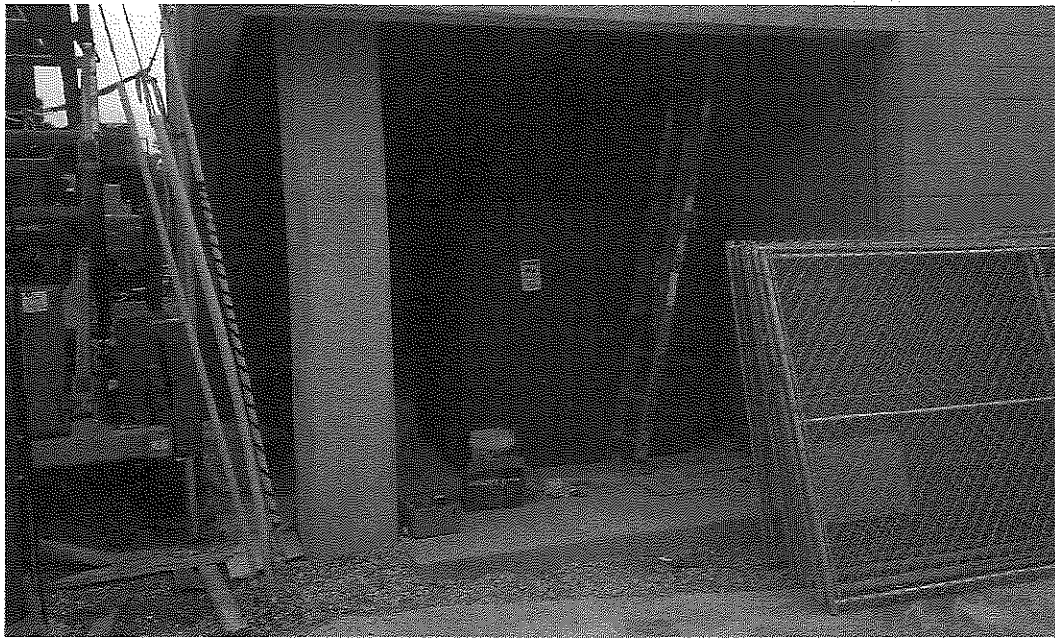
Concrete slab for transformer at northwest corner of building (view to east-southeast; June 19, 2014).
